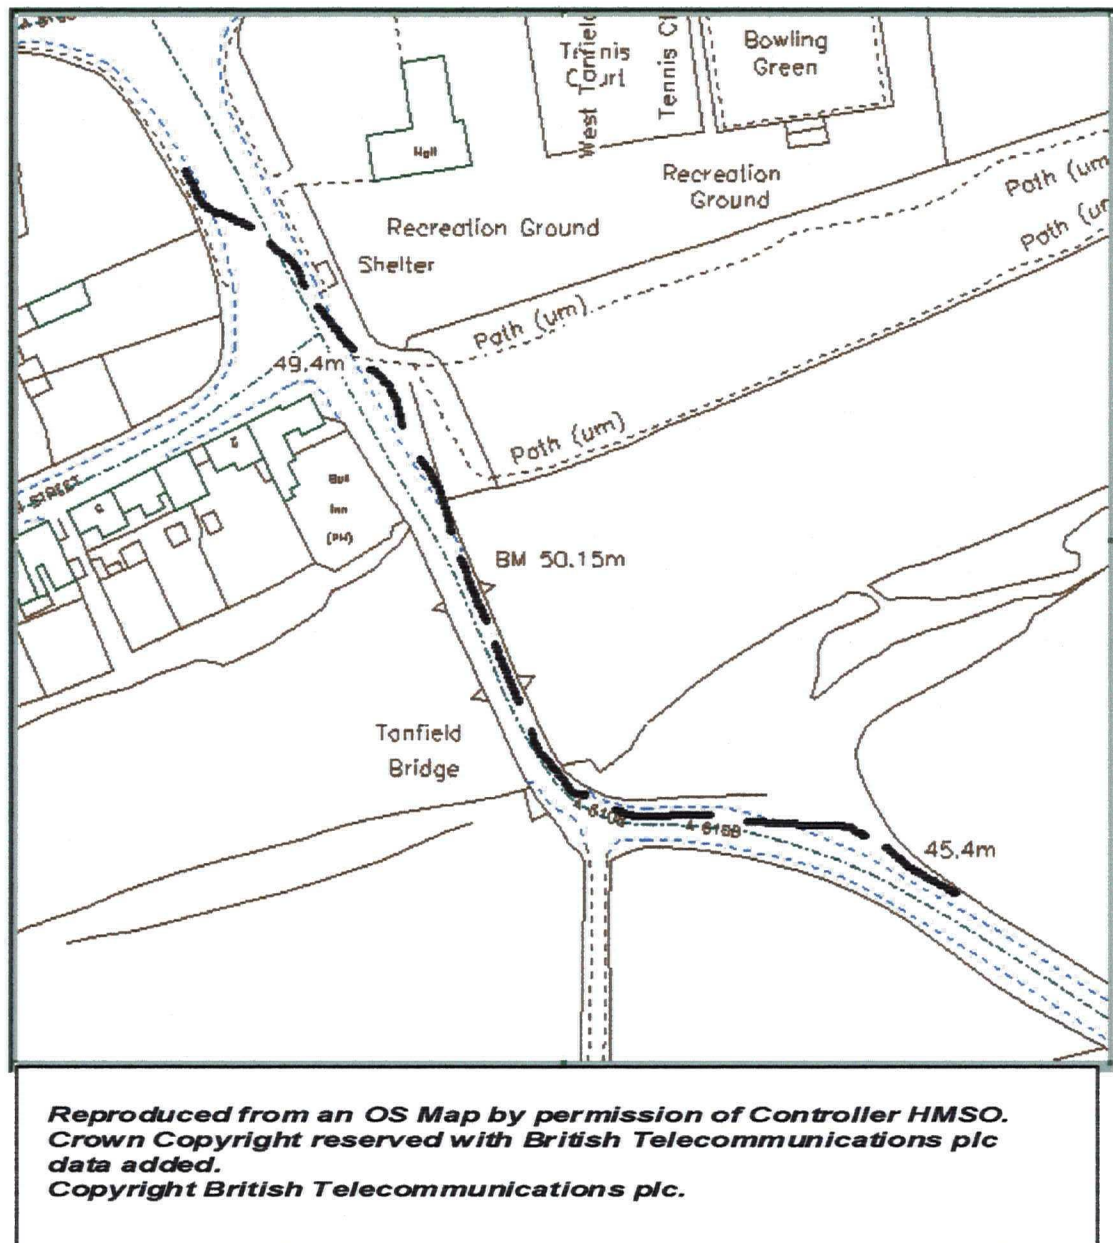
, Location of proposed new ductwork across Tanfield Bridge
